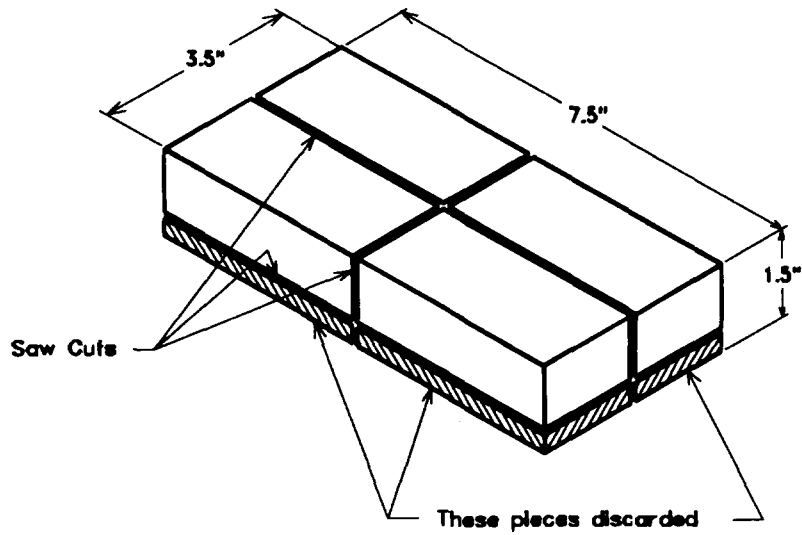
Cut Plan for Producing Reduced-scale Units from Pavers
